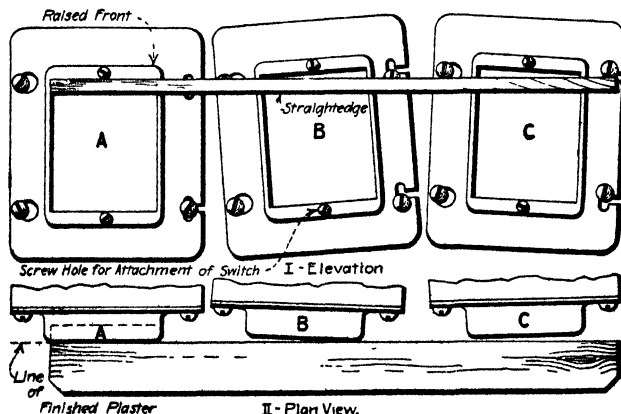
Straightedge used for alignment of box-cover fronts.
